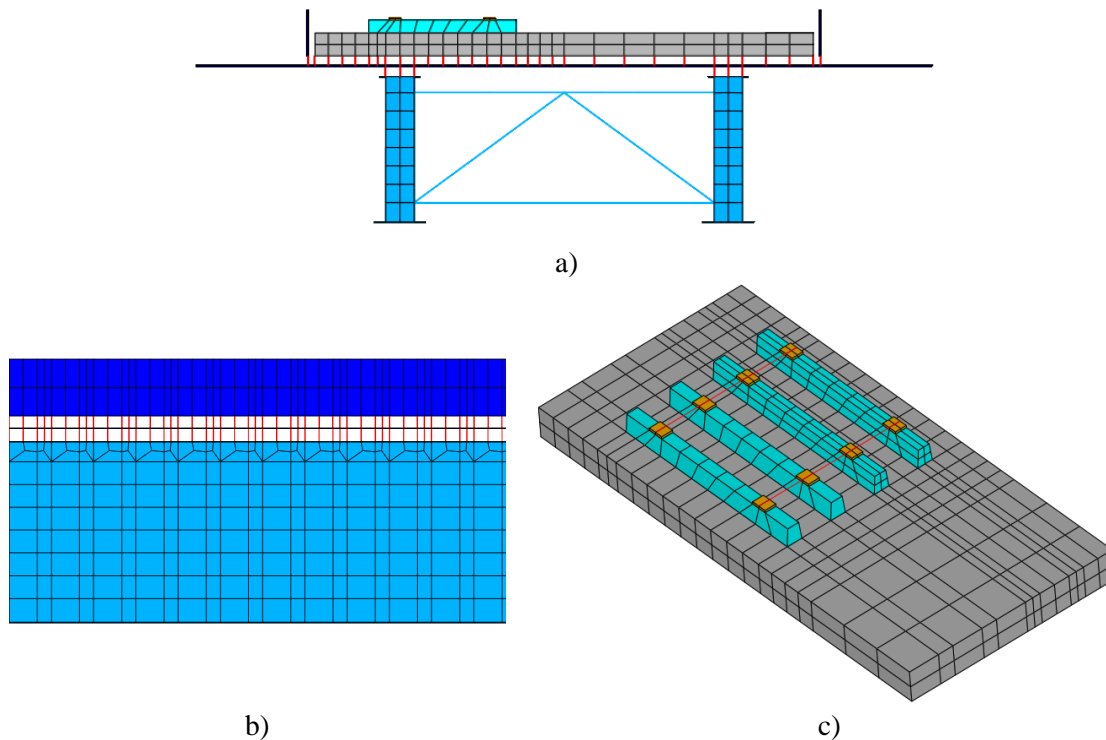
Detailed views of the adopted FE mesh: a) cross section; b) girder-slab connection area; c) track components
